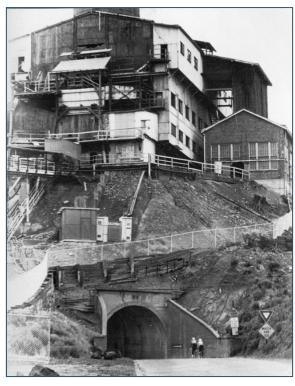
Ruston Tunnel under the former Asarco plant. Photo courtesy of Sherri Forch.
